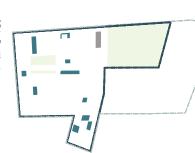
Buildings of 6 to 6+attic storeys
